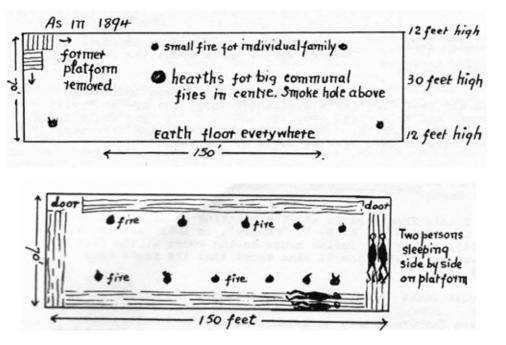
SKETCHES OF FALSE CREEK RESERVE LONGHOUSE BY METHODIST MINISTER GEORGE RALEY AND AUGUST JACK KHAHTSAHLANO SOURCE: UBC BC STUDIES, JEAN BARMAN
